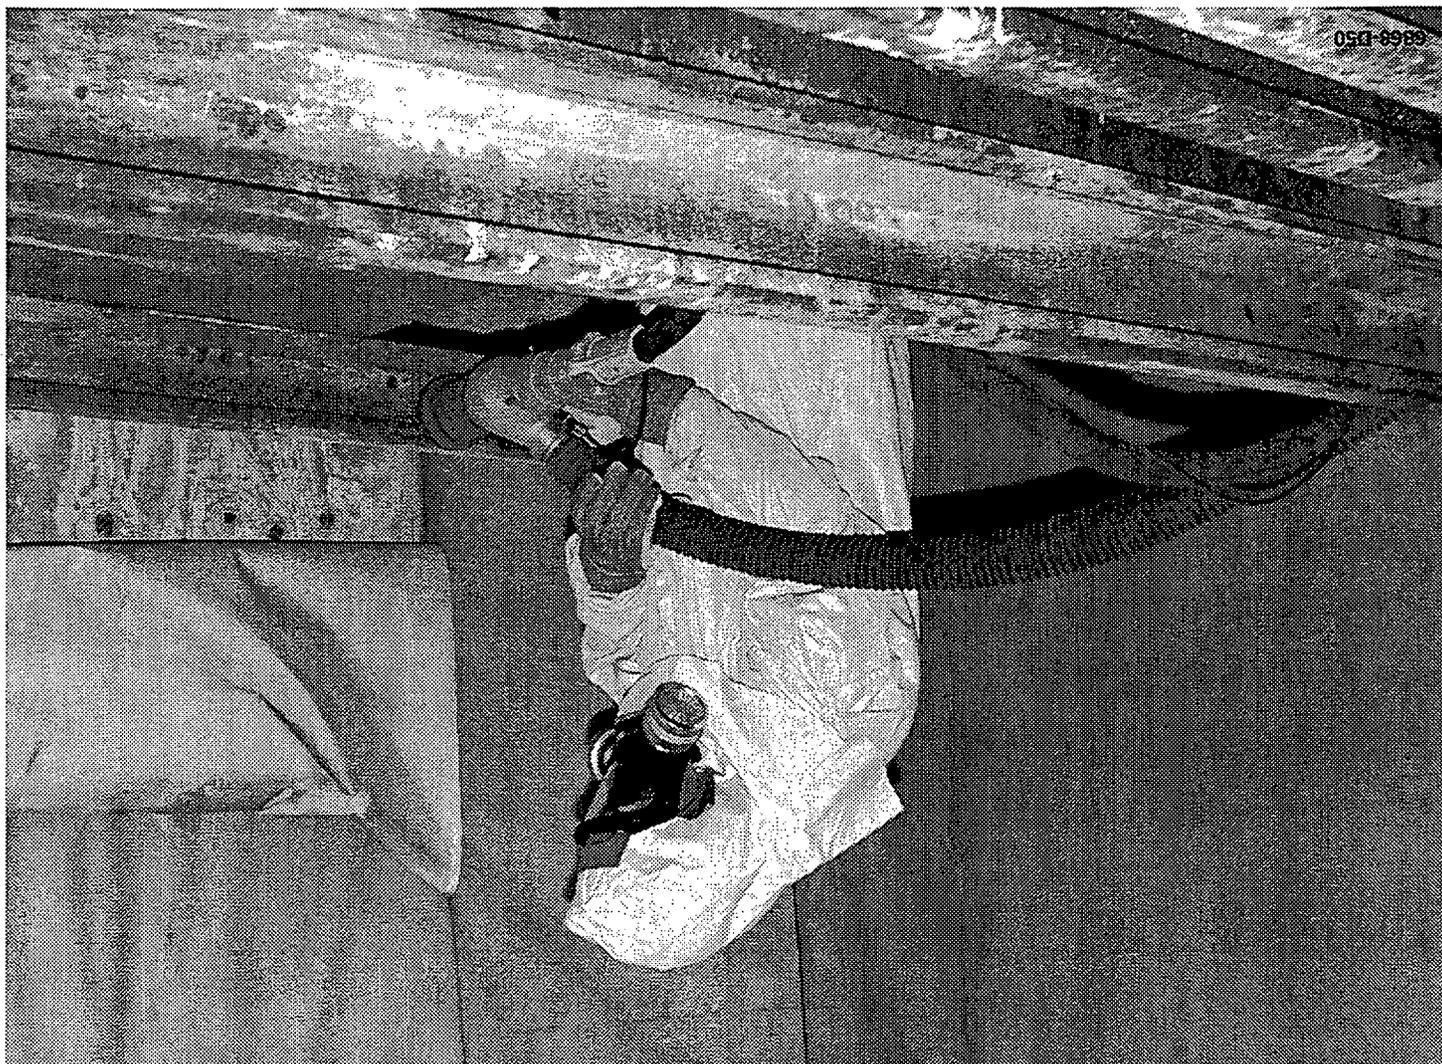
Material Release Facility - Steel Rail #6868-D50
